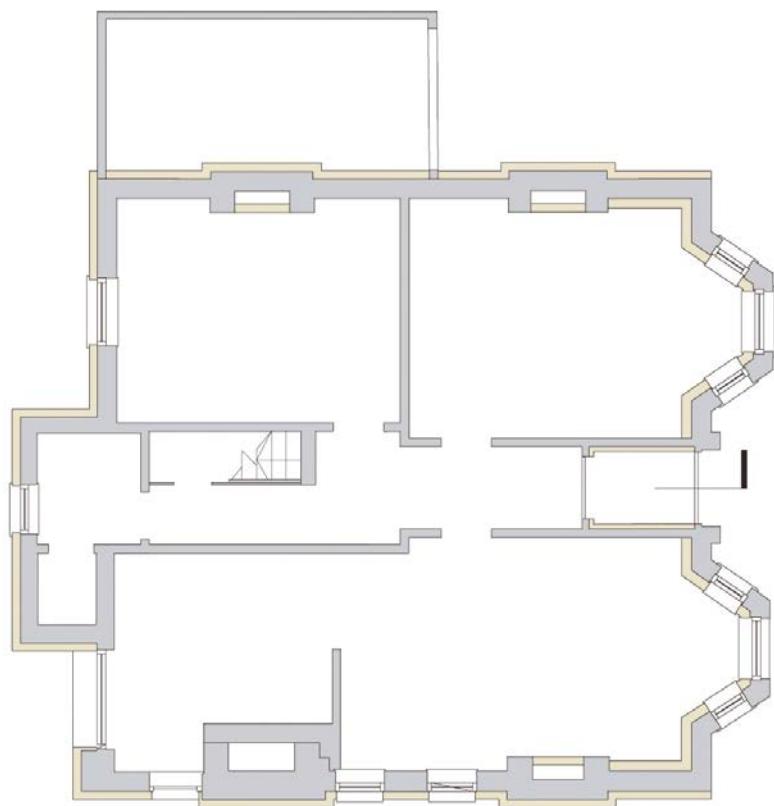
Ground floor plan - Marion Baeli and Paul Davis + Partners^{6.3}
